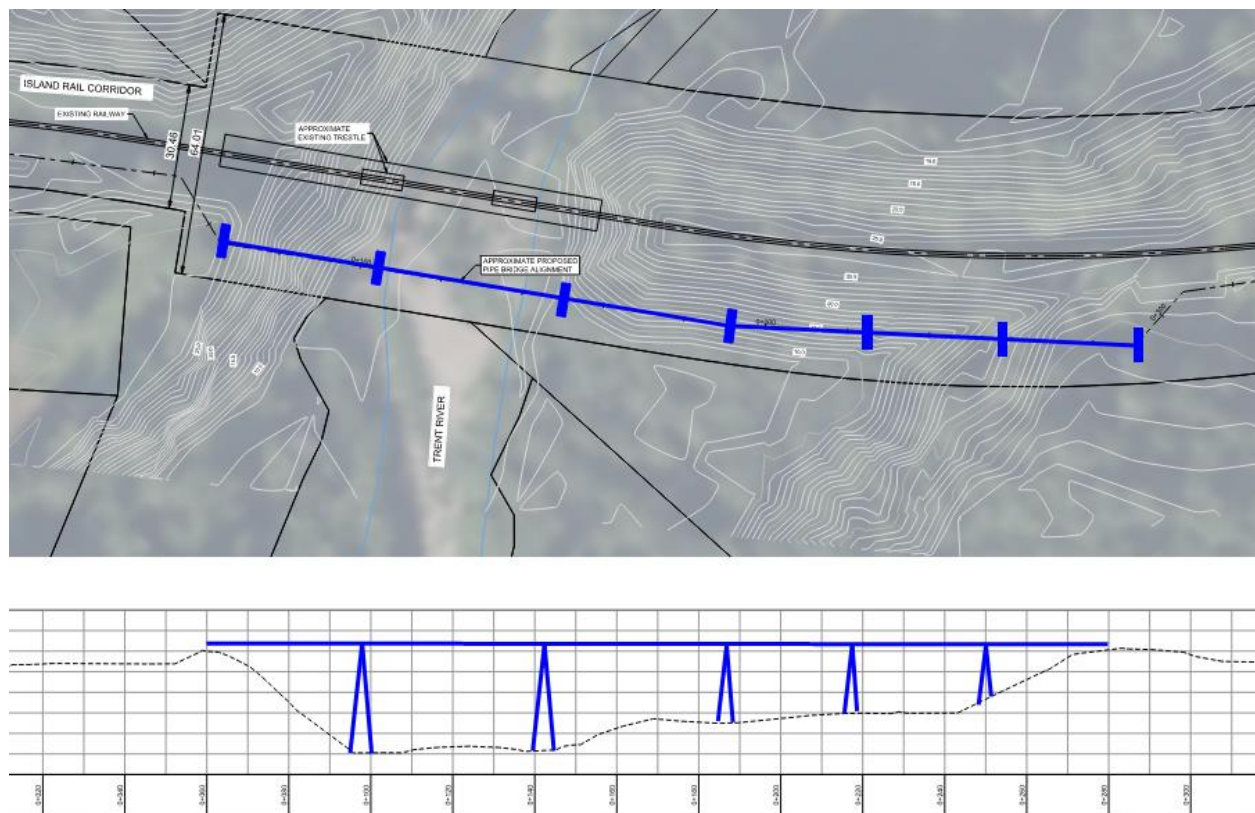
Railway Corridor Bridge Crossing (excerpt from SK-04)
